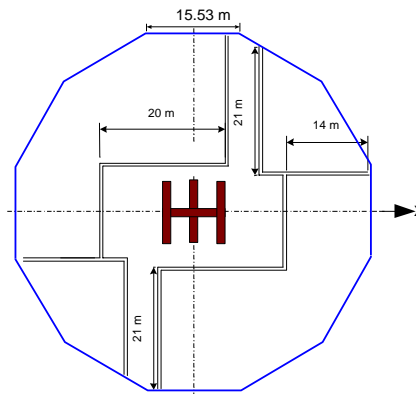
Plan view of dodecagon shape- equivalent to the Central configuration
